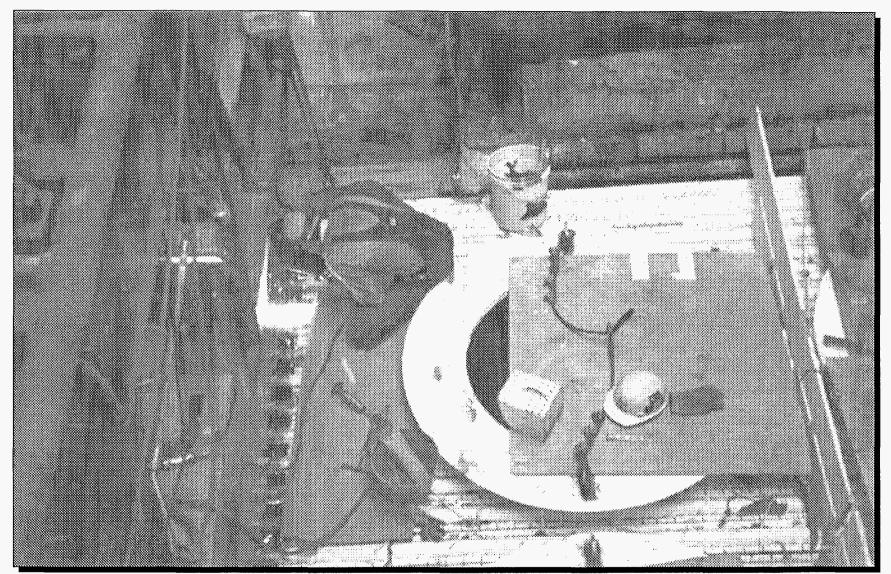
Photo of Furnace Being Modified (Looking Down onto Top of Furnace Roof)
